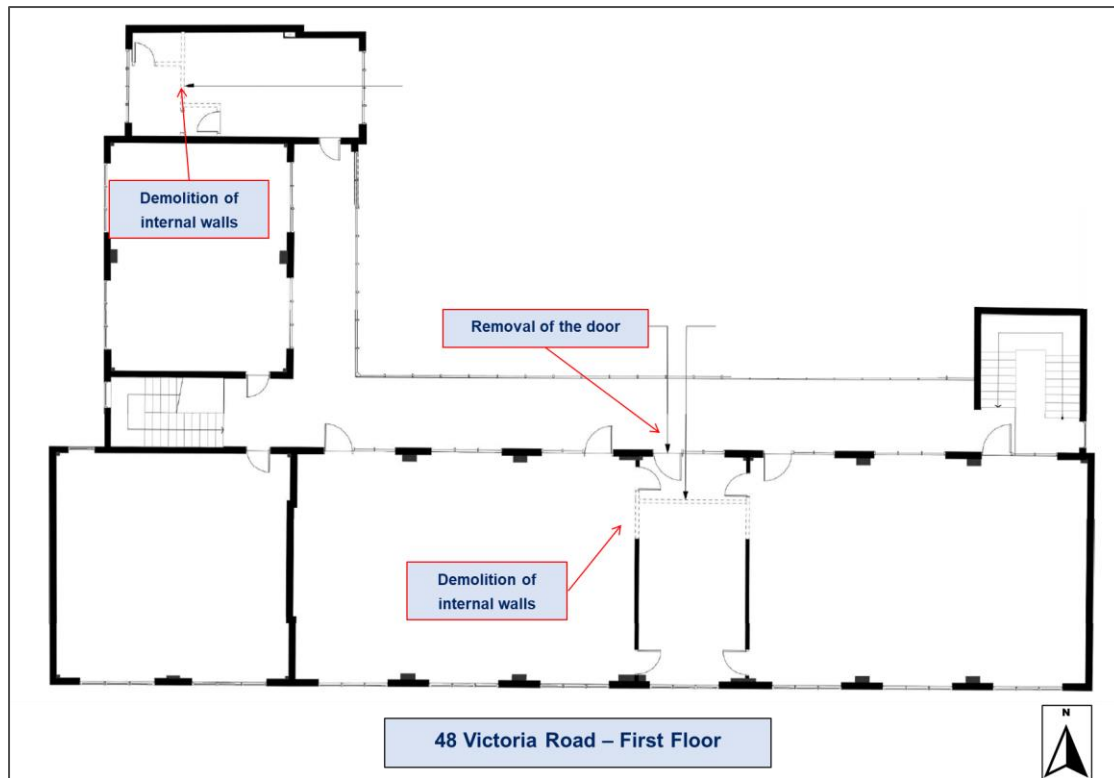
| Proposed demolition works – Victoria Road site (Source: Applicant's RtS 2022)
